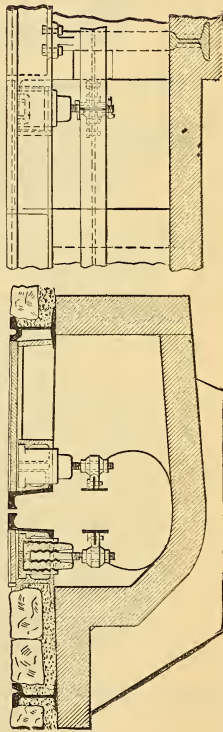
Plan and Section of Conduit, showing G Conductor Support, Metropolitan Railroad, Washington, 1895.
